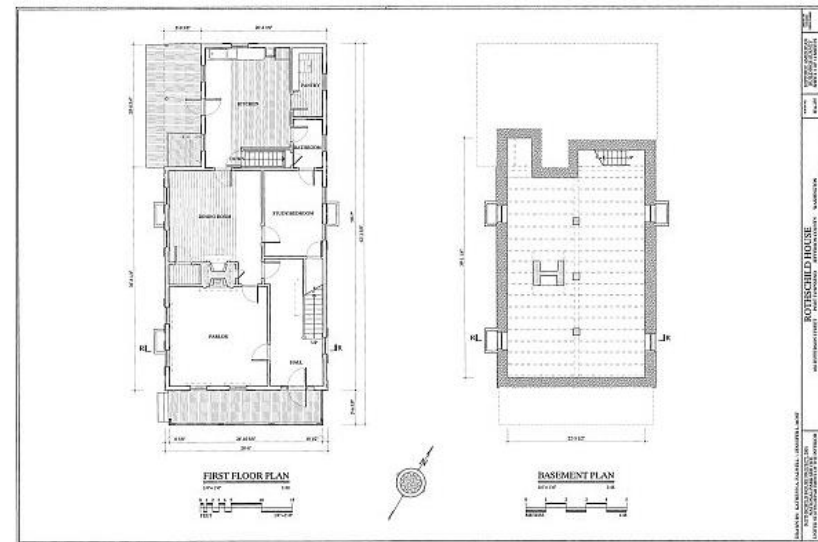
Rothschild House Plan. Accessed February 21, 2016. HABS <https://www.loc.gov/item/wa0717/>.
